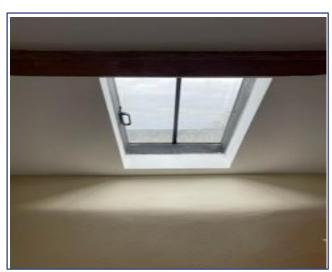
The Byre Bedroom 3 conservation roof light window and oak beam on the north elevation.
